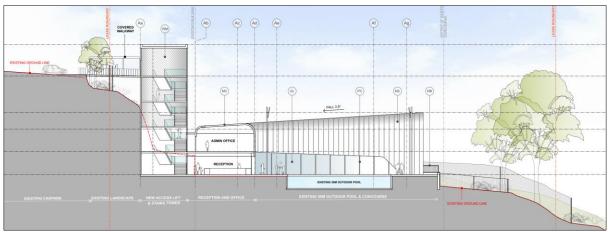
Section Plan looking north showing extent of cut by identifying proposed development and existing natural ground level (*Source: Section Plan prepared by: Brewster Hjorth Architects submitted with application*)
